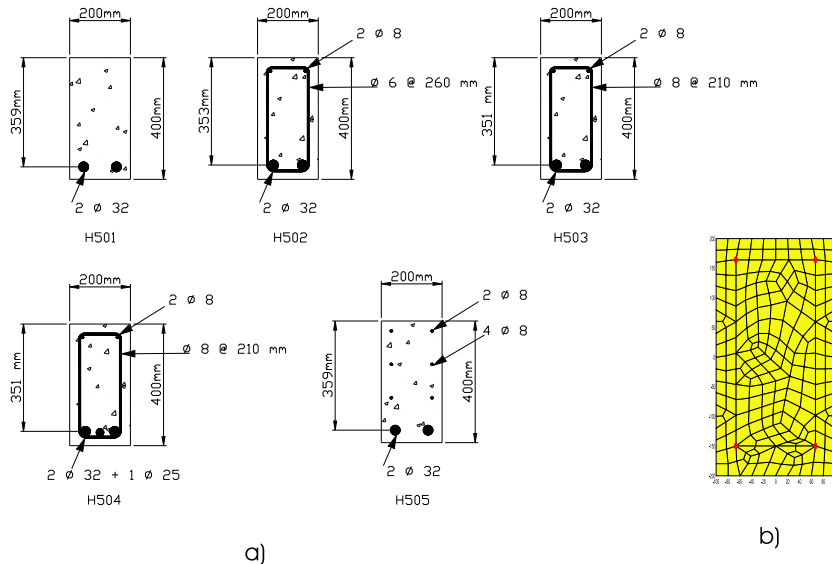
Set of beams analyzed. a) cross sections, b) typical cross-section mesh.
